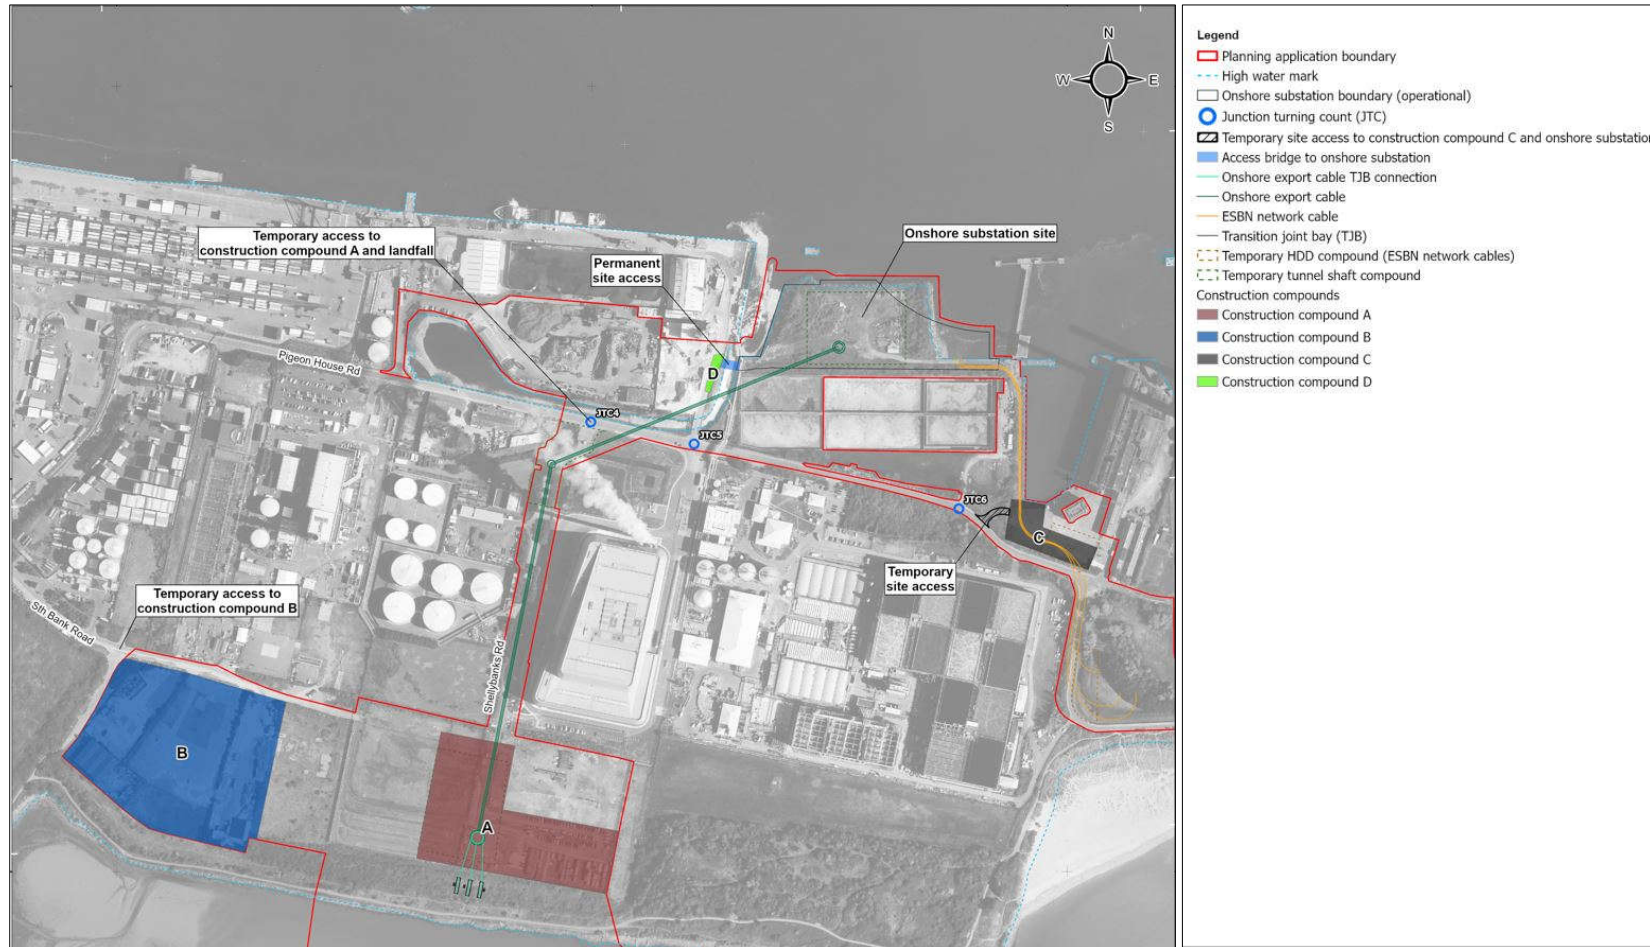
Onshore development area – onshore export cable, tunnel (Extracted from Drawing No. CWP-TOB-ENG-08-01-MAP-0981)
